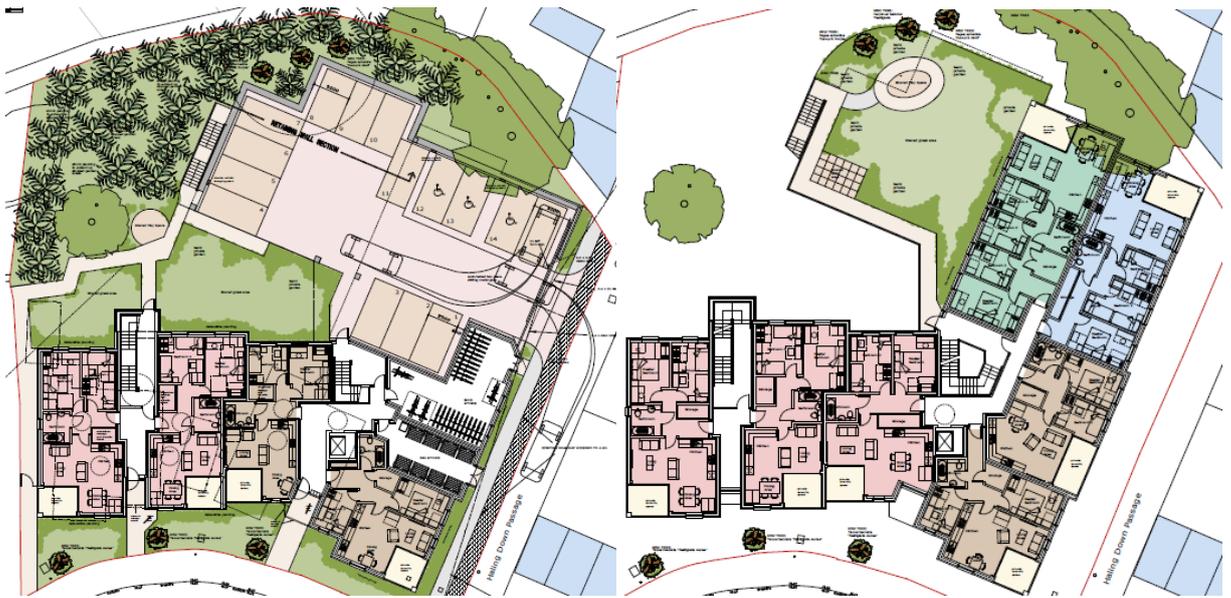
Site/Ground Floor Plan (left) and First Floor Plan (right)
